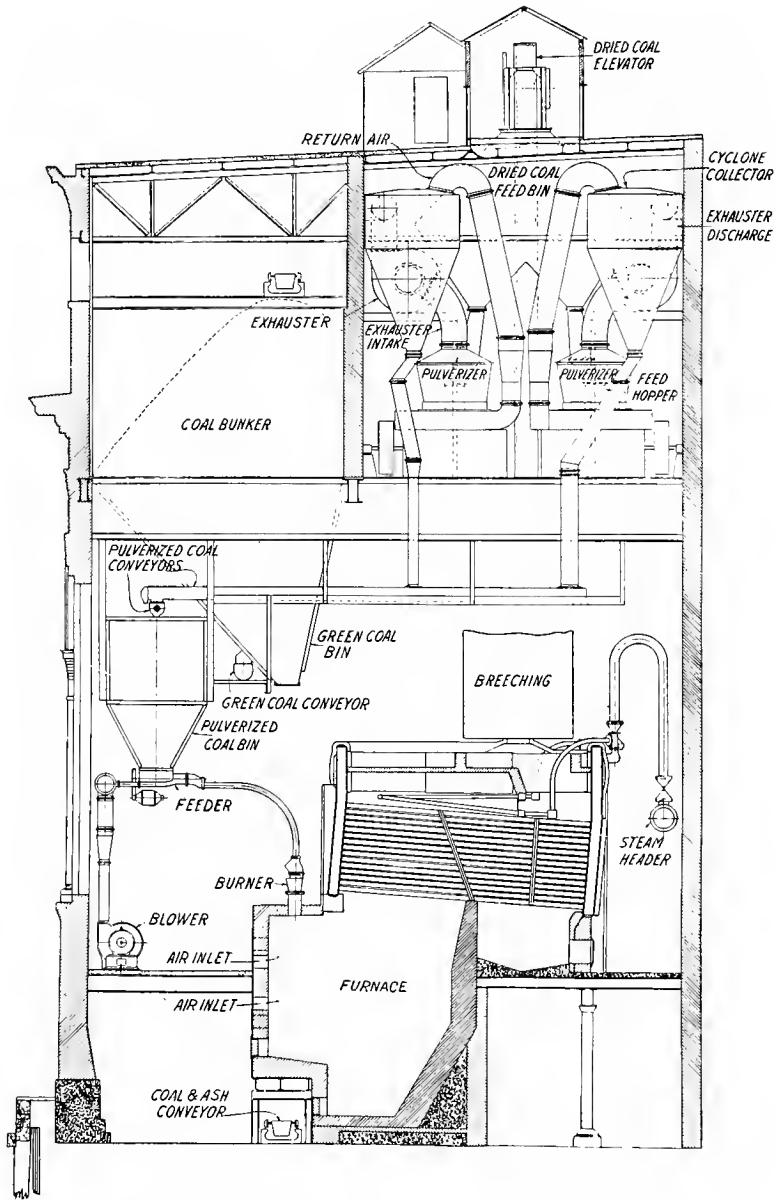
Sectional Arrangement of the Oneida Street Plant.
